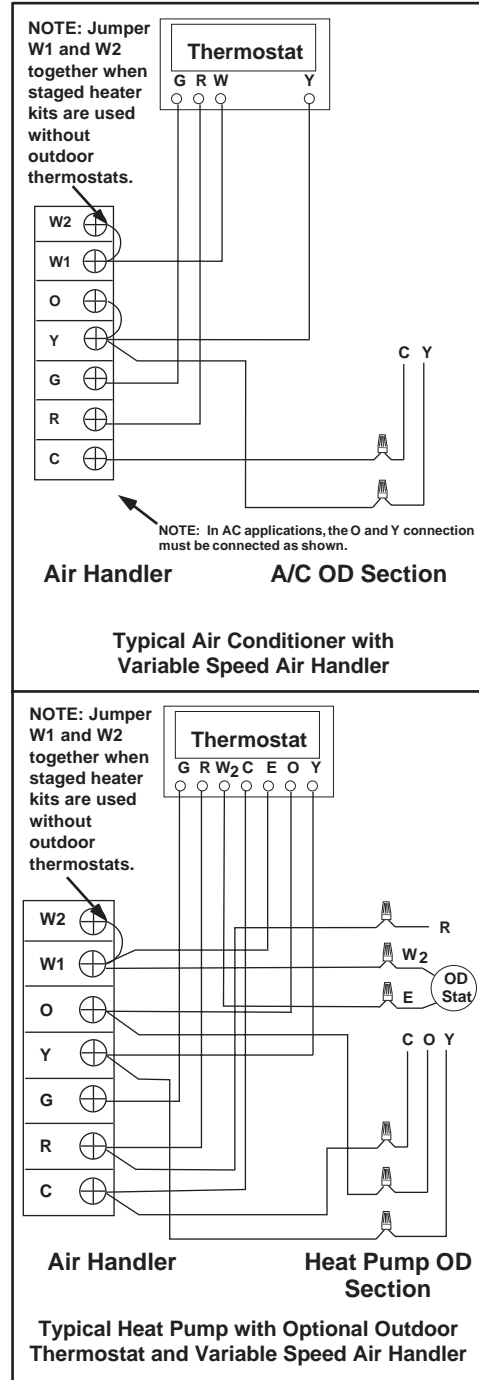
Typical Air Conditioning and Heat Pump System Connections
